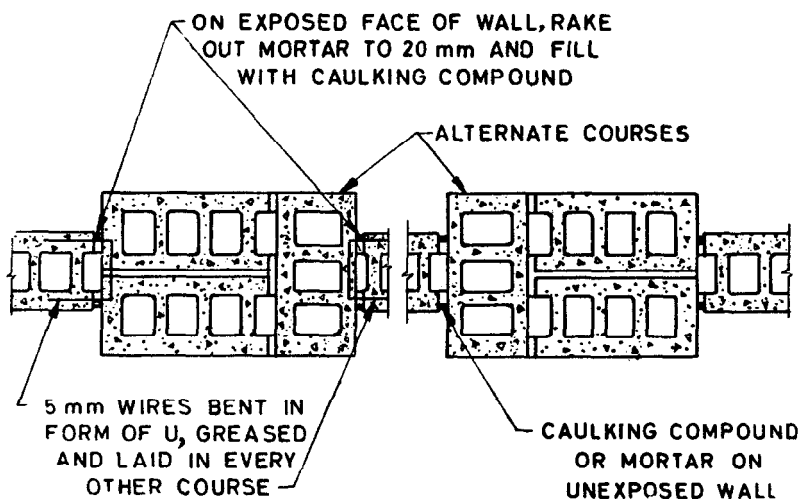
CONTROL JOINTS IN CONCRETE BLOCK MASONRY CONSTRUCTION
